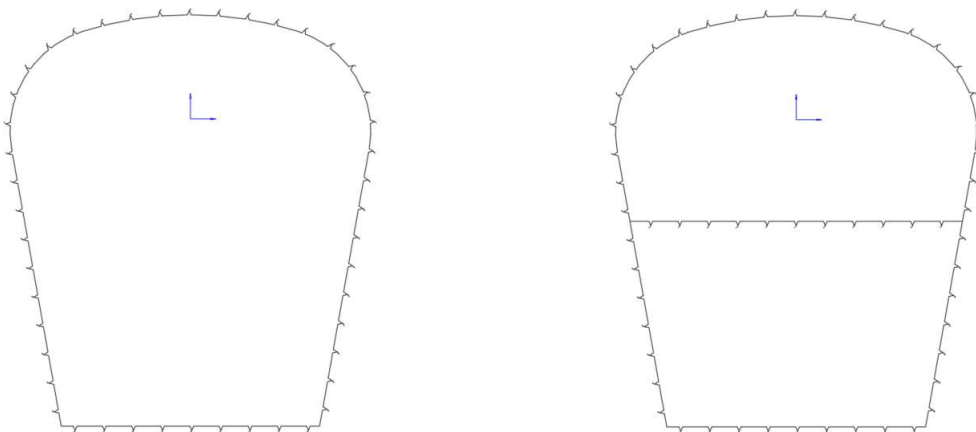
Tunnel type 3 - Full face or phase 1 and 2 excavation
